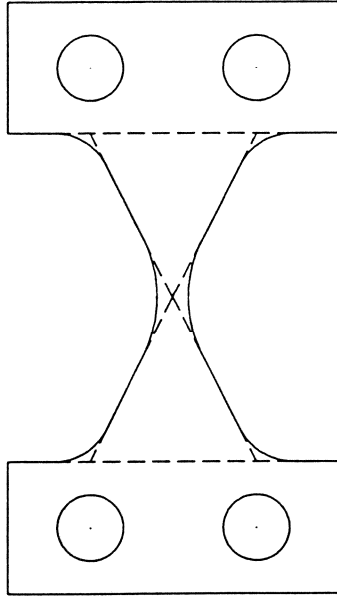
ADAS X-shaped Steel Plate and Installation Detail (from Whittaker 1989)
